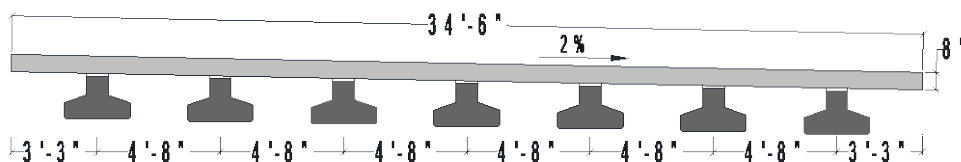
Cross-Section of Precast Bridge System with Single-Unit Panel
